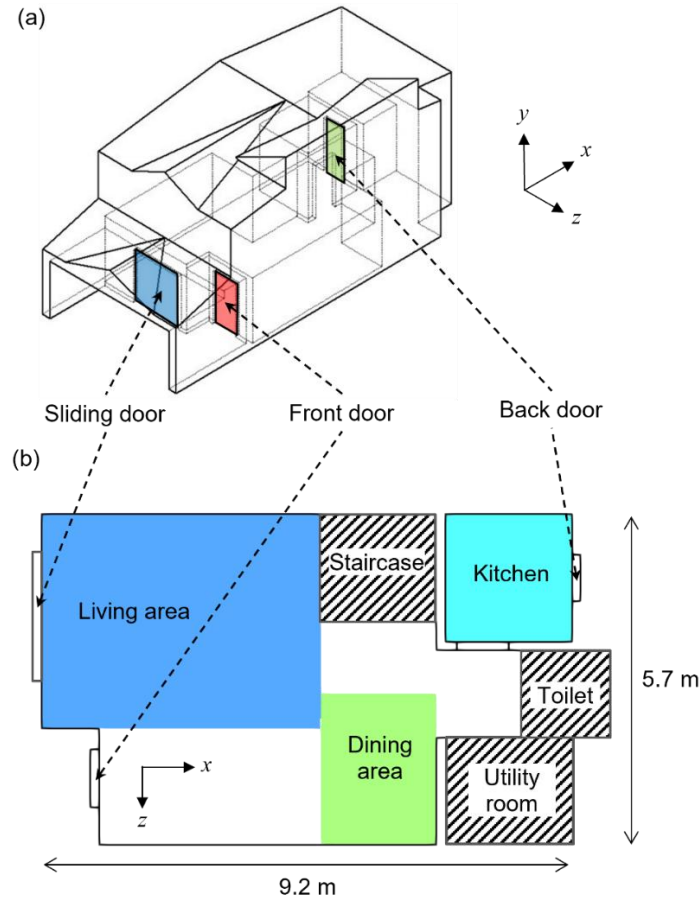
Detailed schematic of a single unit terrace house (a) opening and (b) space layout
